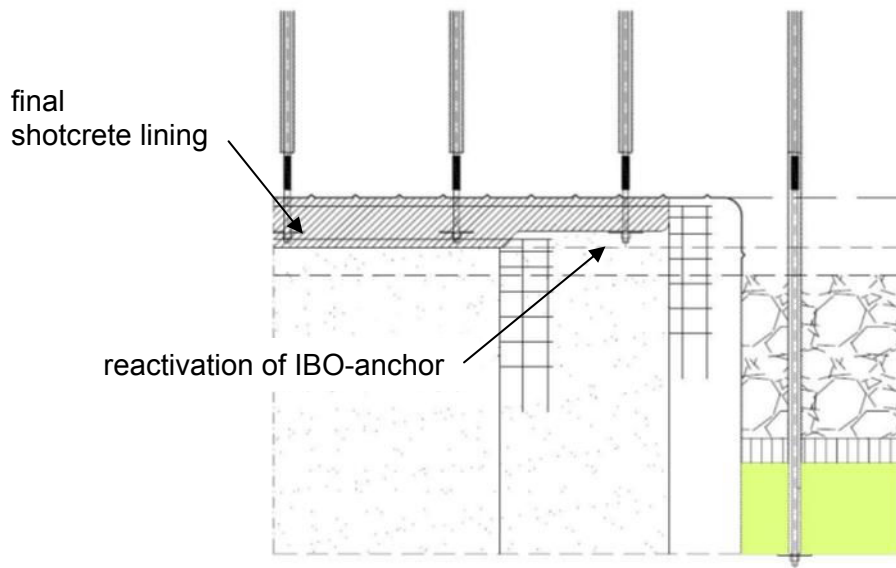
, tunnel enlargement – Phase 4, tunnel cross section (source Beton- und Monierbau)
